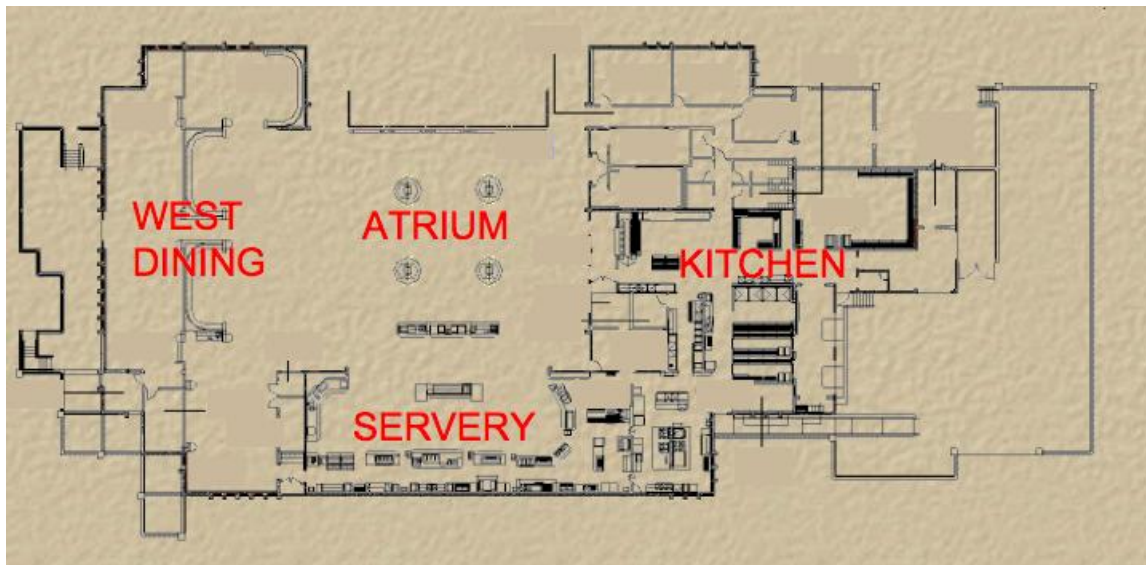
HOCH-SHANAHAN DINING COMMONS FLOOR PLAN
